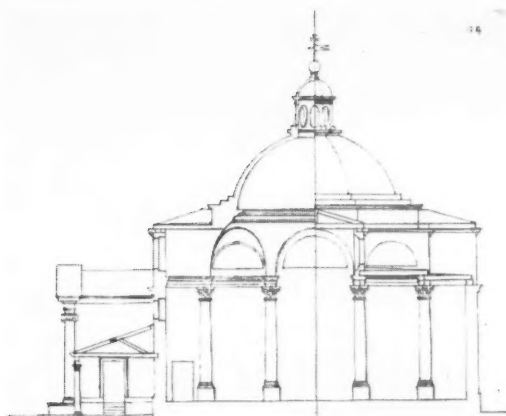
St. Stephen, Walbrook. Section, showing proposed porch and loggia on north side
